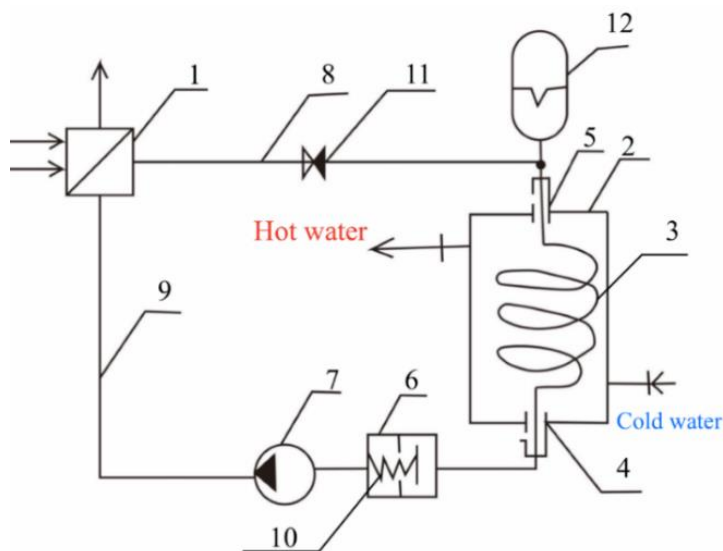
The principle of operation of the scheme: 1 — hot water boiler; 2 — heat exchanger-accumulator; 3 — coil; 4, 5 — movable support; 6 — shock valve; 7 — centrifugal pump; 8 — supply pipeline; 9 — return pipeline; 10 — spring; 11 — check valve; 12 — hydraulic accumulator
